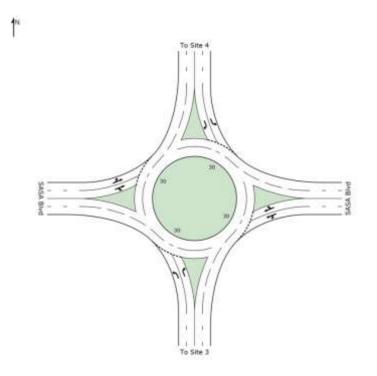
Future layout of SASA Boulevard Roundabout B
